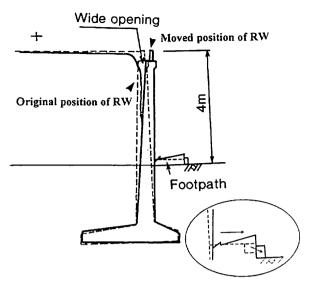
Typical damage to cantilever-type RC RWs for embankment along JR Sanyo Line between Hyogo and Shin-Nagata Stations (Site CL1 in Fig. 2)
